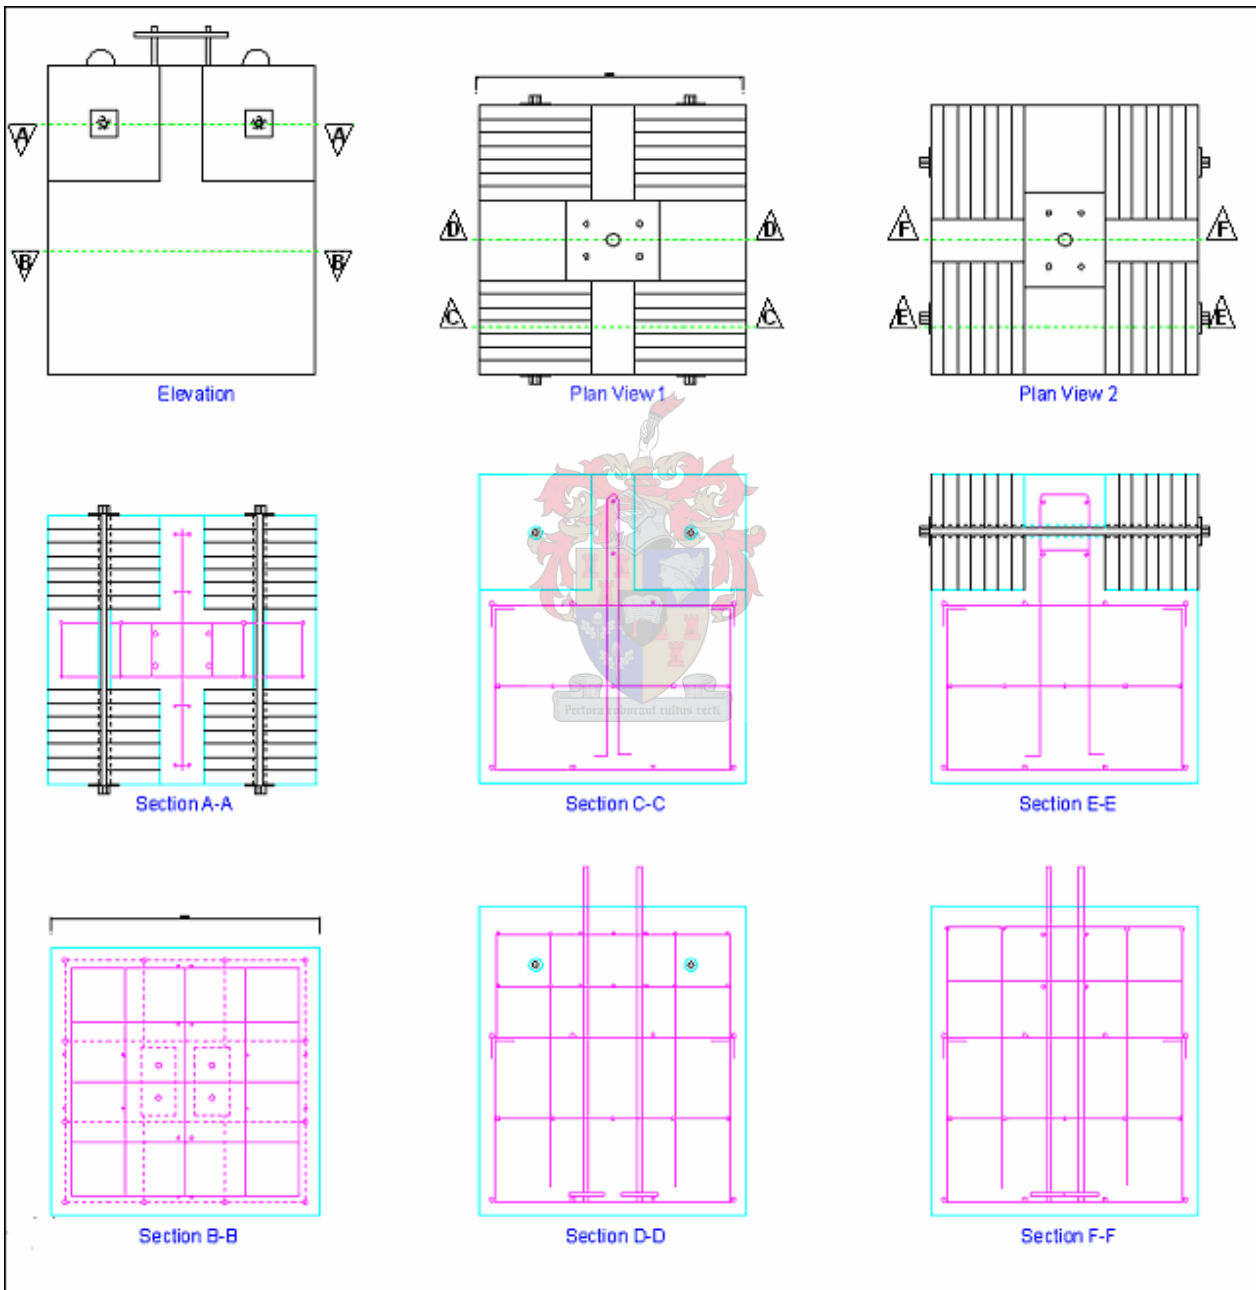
Design drawings of reinforced concrete for 5 ton payload
